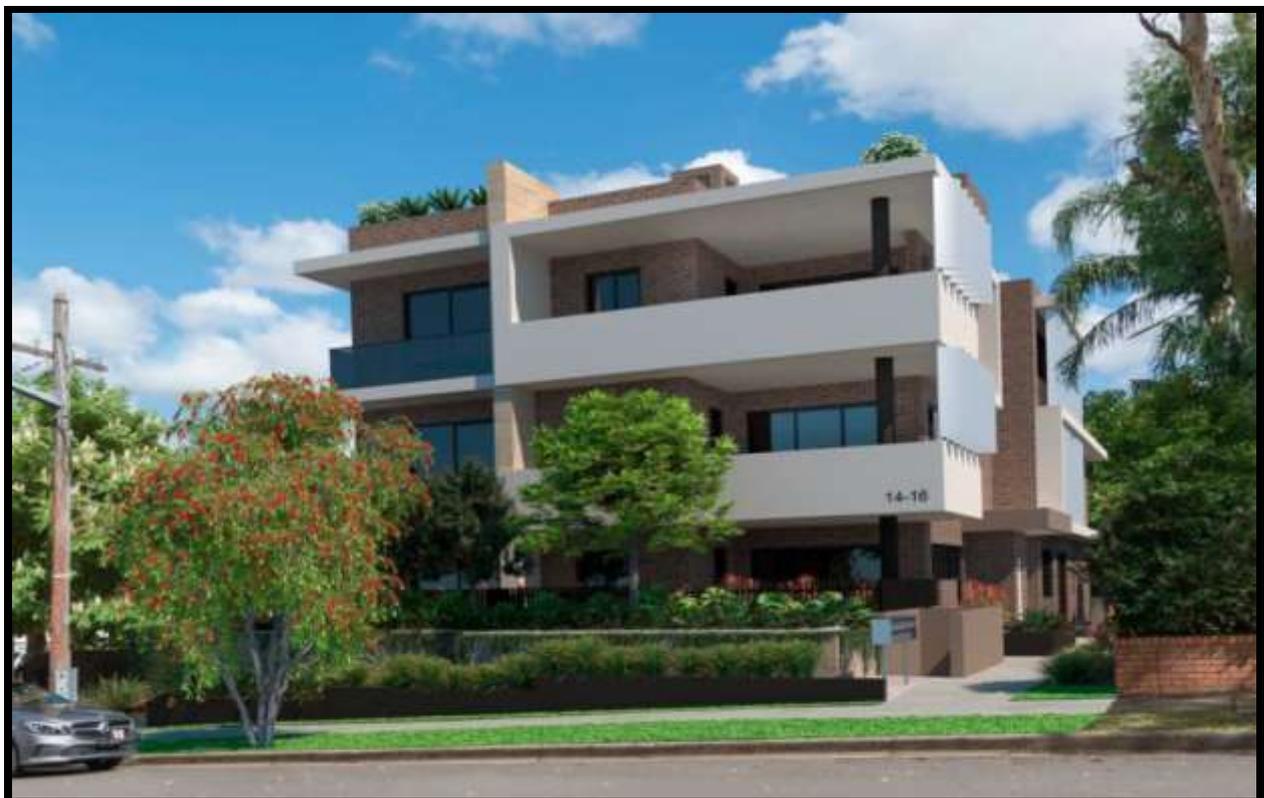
Building rendered indicating the siting, visibility and treatment of the roof top structures (courtesy: BMA Urban, 2020)
